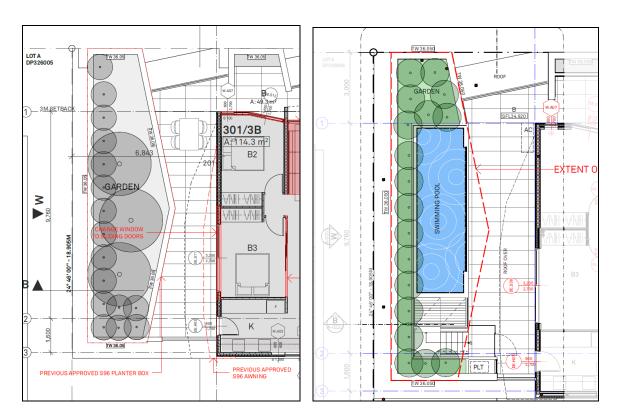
Approved roof terrace (left) and proposed roof terrace with pool (right)
